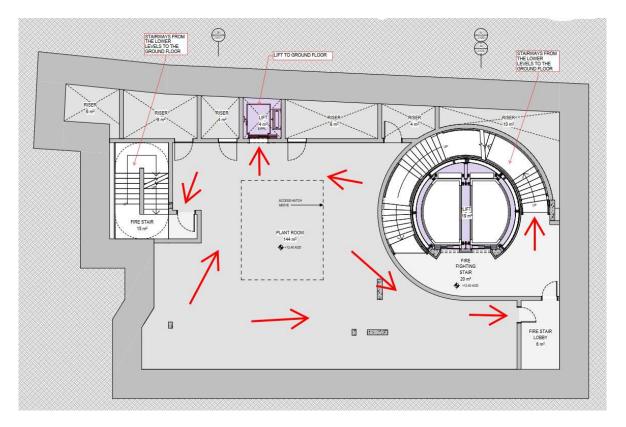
Furnival Street - Level B2 Evacuation Route Plan
